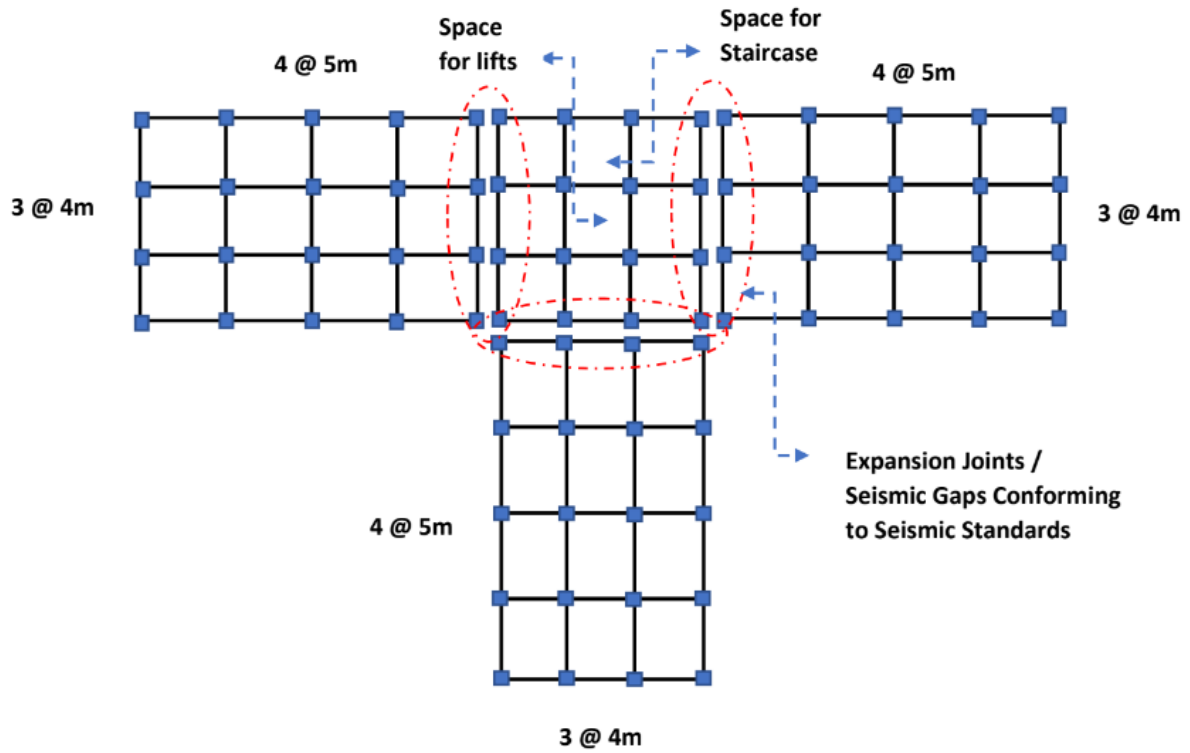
Typical Plan layout (except top storey) of a G+4 storeyed building with open ground storey
